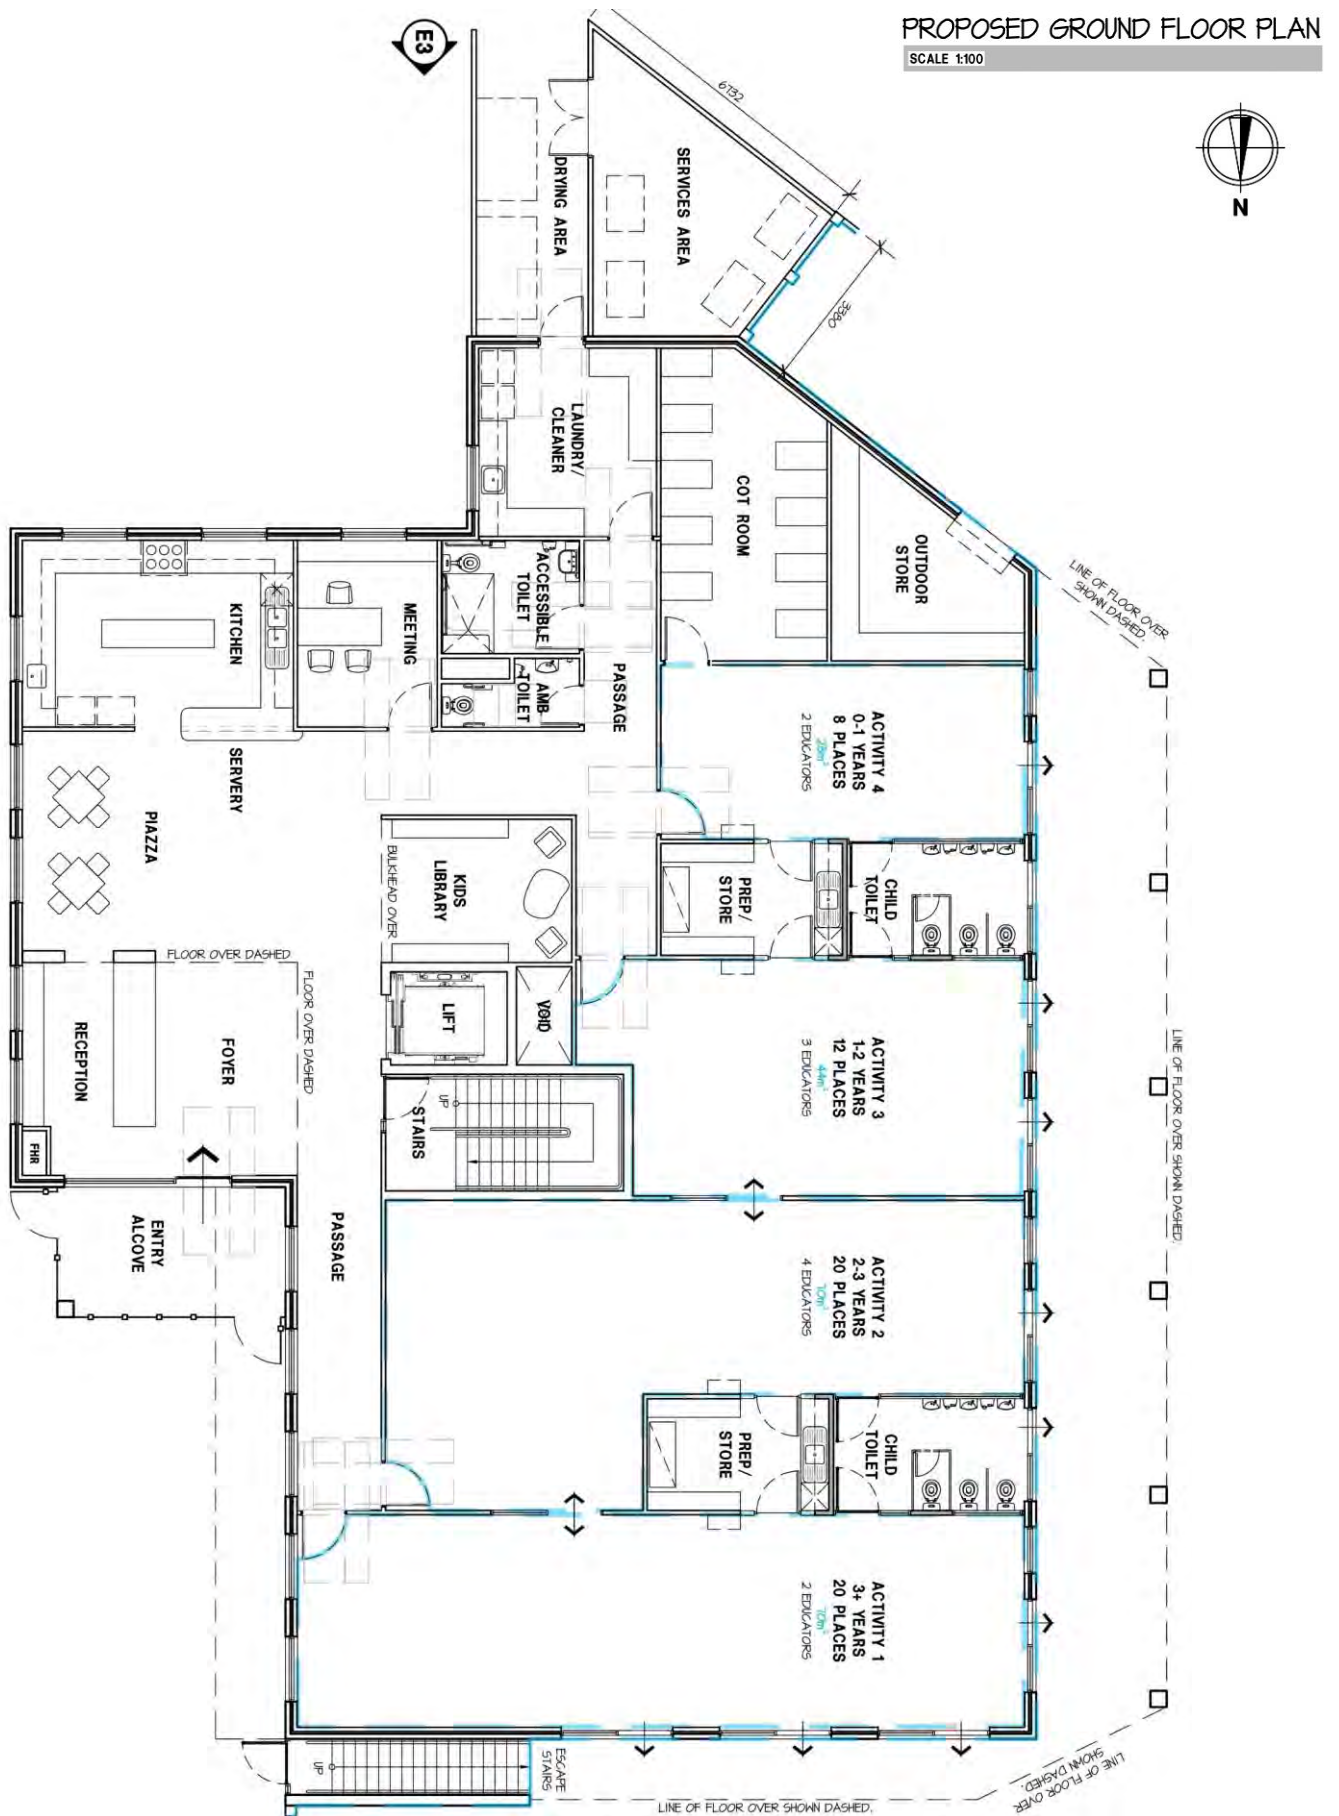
Ground floor plan for the proposed Shoalwater Childcare Centre
